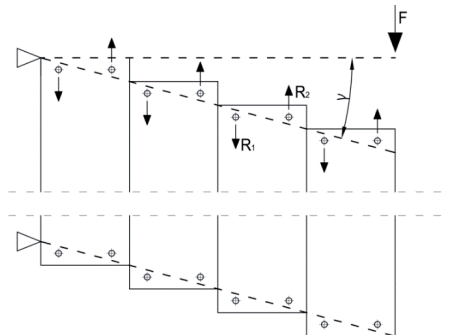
Assumption of transferring load F acting in sheeting plane by sandwich panels
